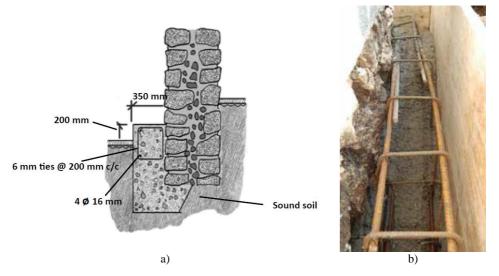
Strengthening of existing foundations: a) external RC belt and b) reinforcement cage and formwork [21]
